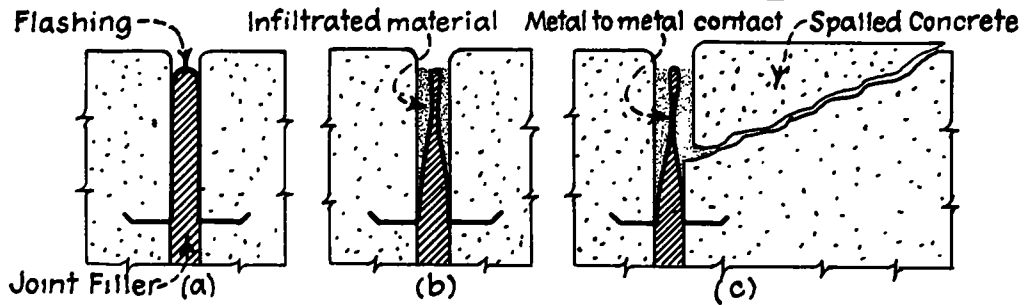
FLASHING DEFORMATION AND SPALLING
